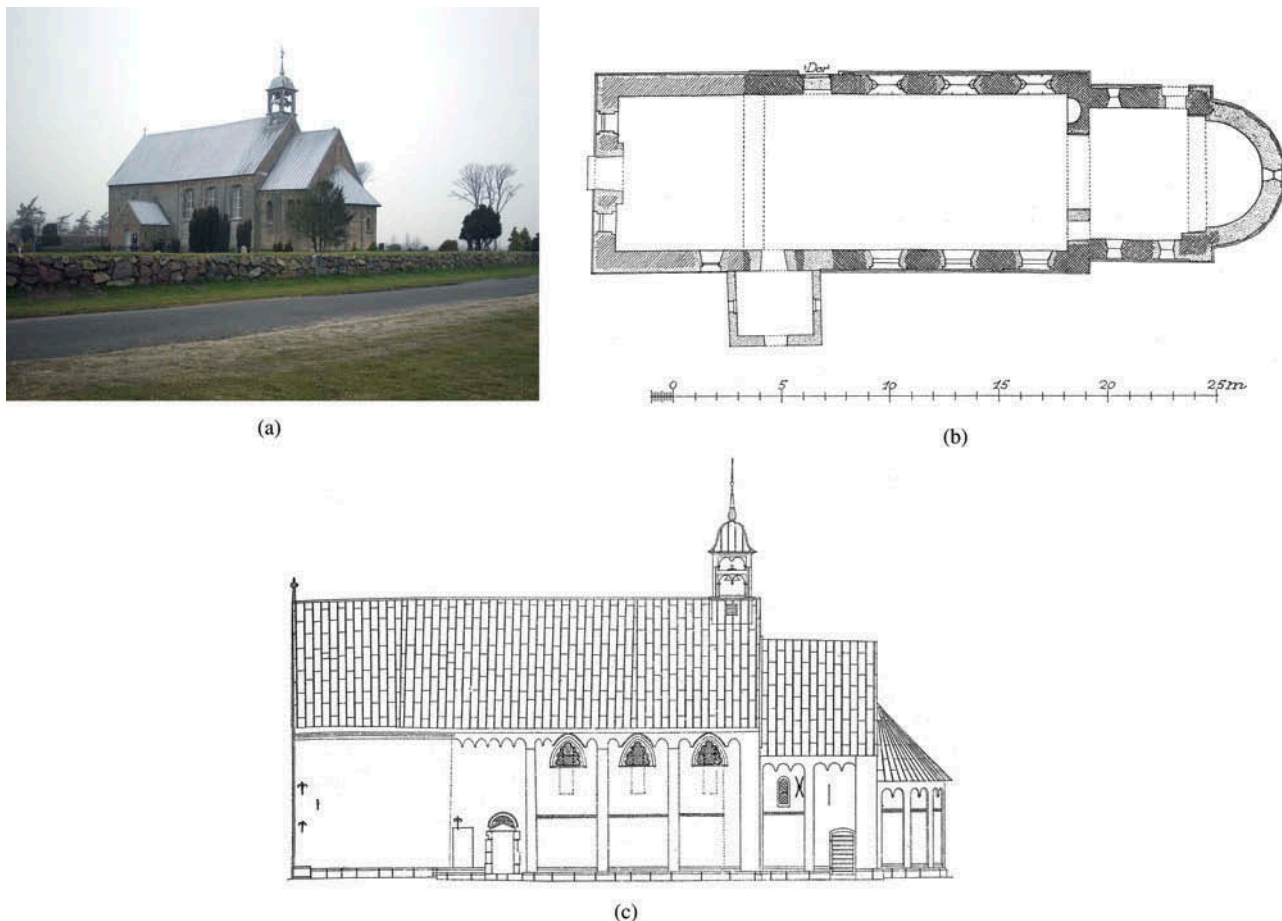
a. Hvidding Church, the church viewed from the south east. b. Ground plan of the church. c. Elevation of the north facade of the church. After *Danmarks Kirker* 1957, p. 1134–1135. Photo: Roberto Fortuna, February 2005.
